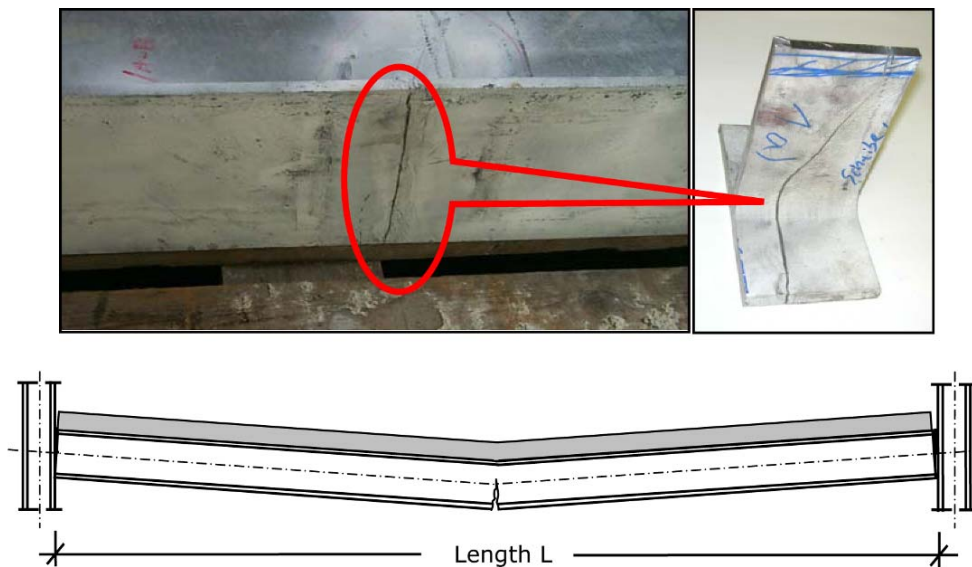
Opening of liquid metal induced crack at a bottom chord of a floor beam observed after concreting of the floor deck
